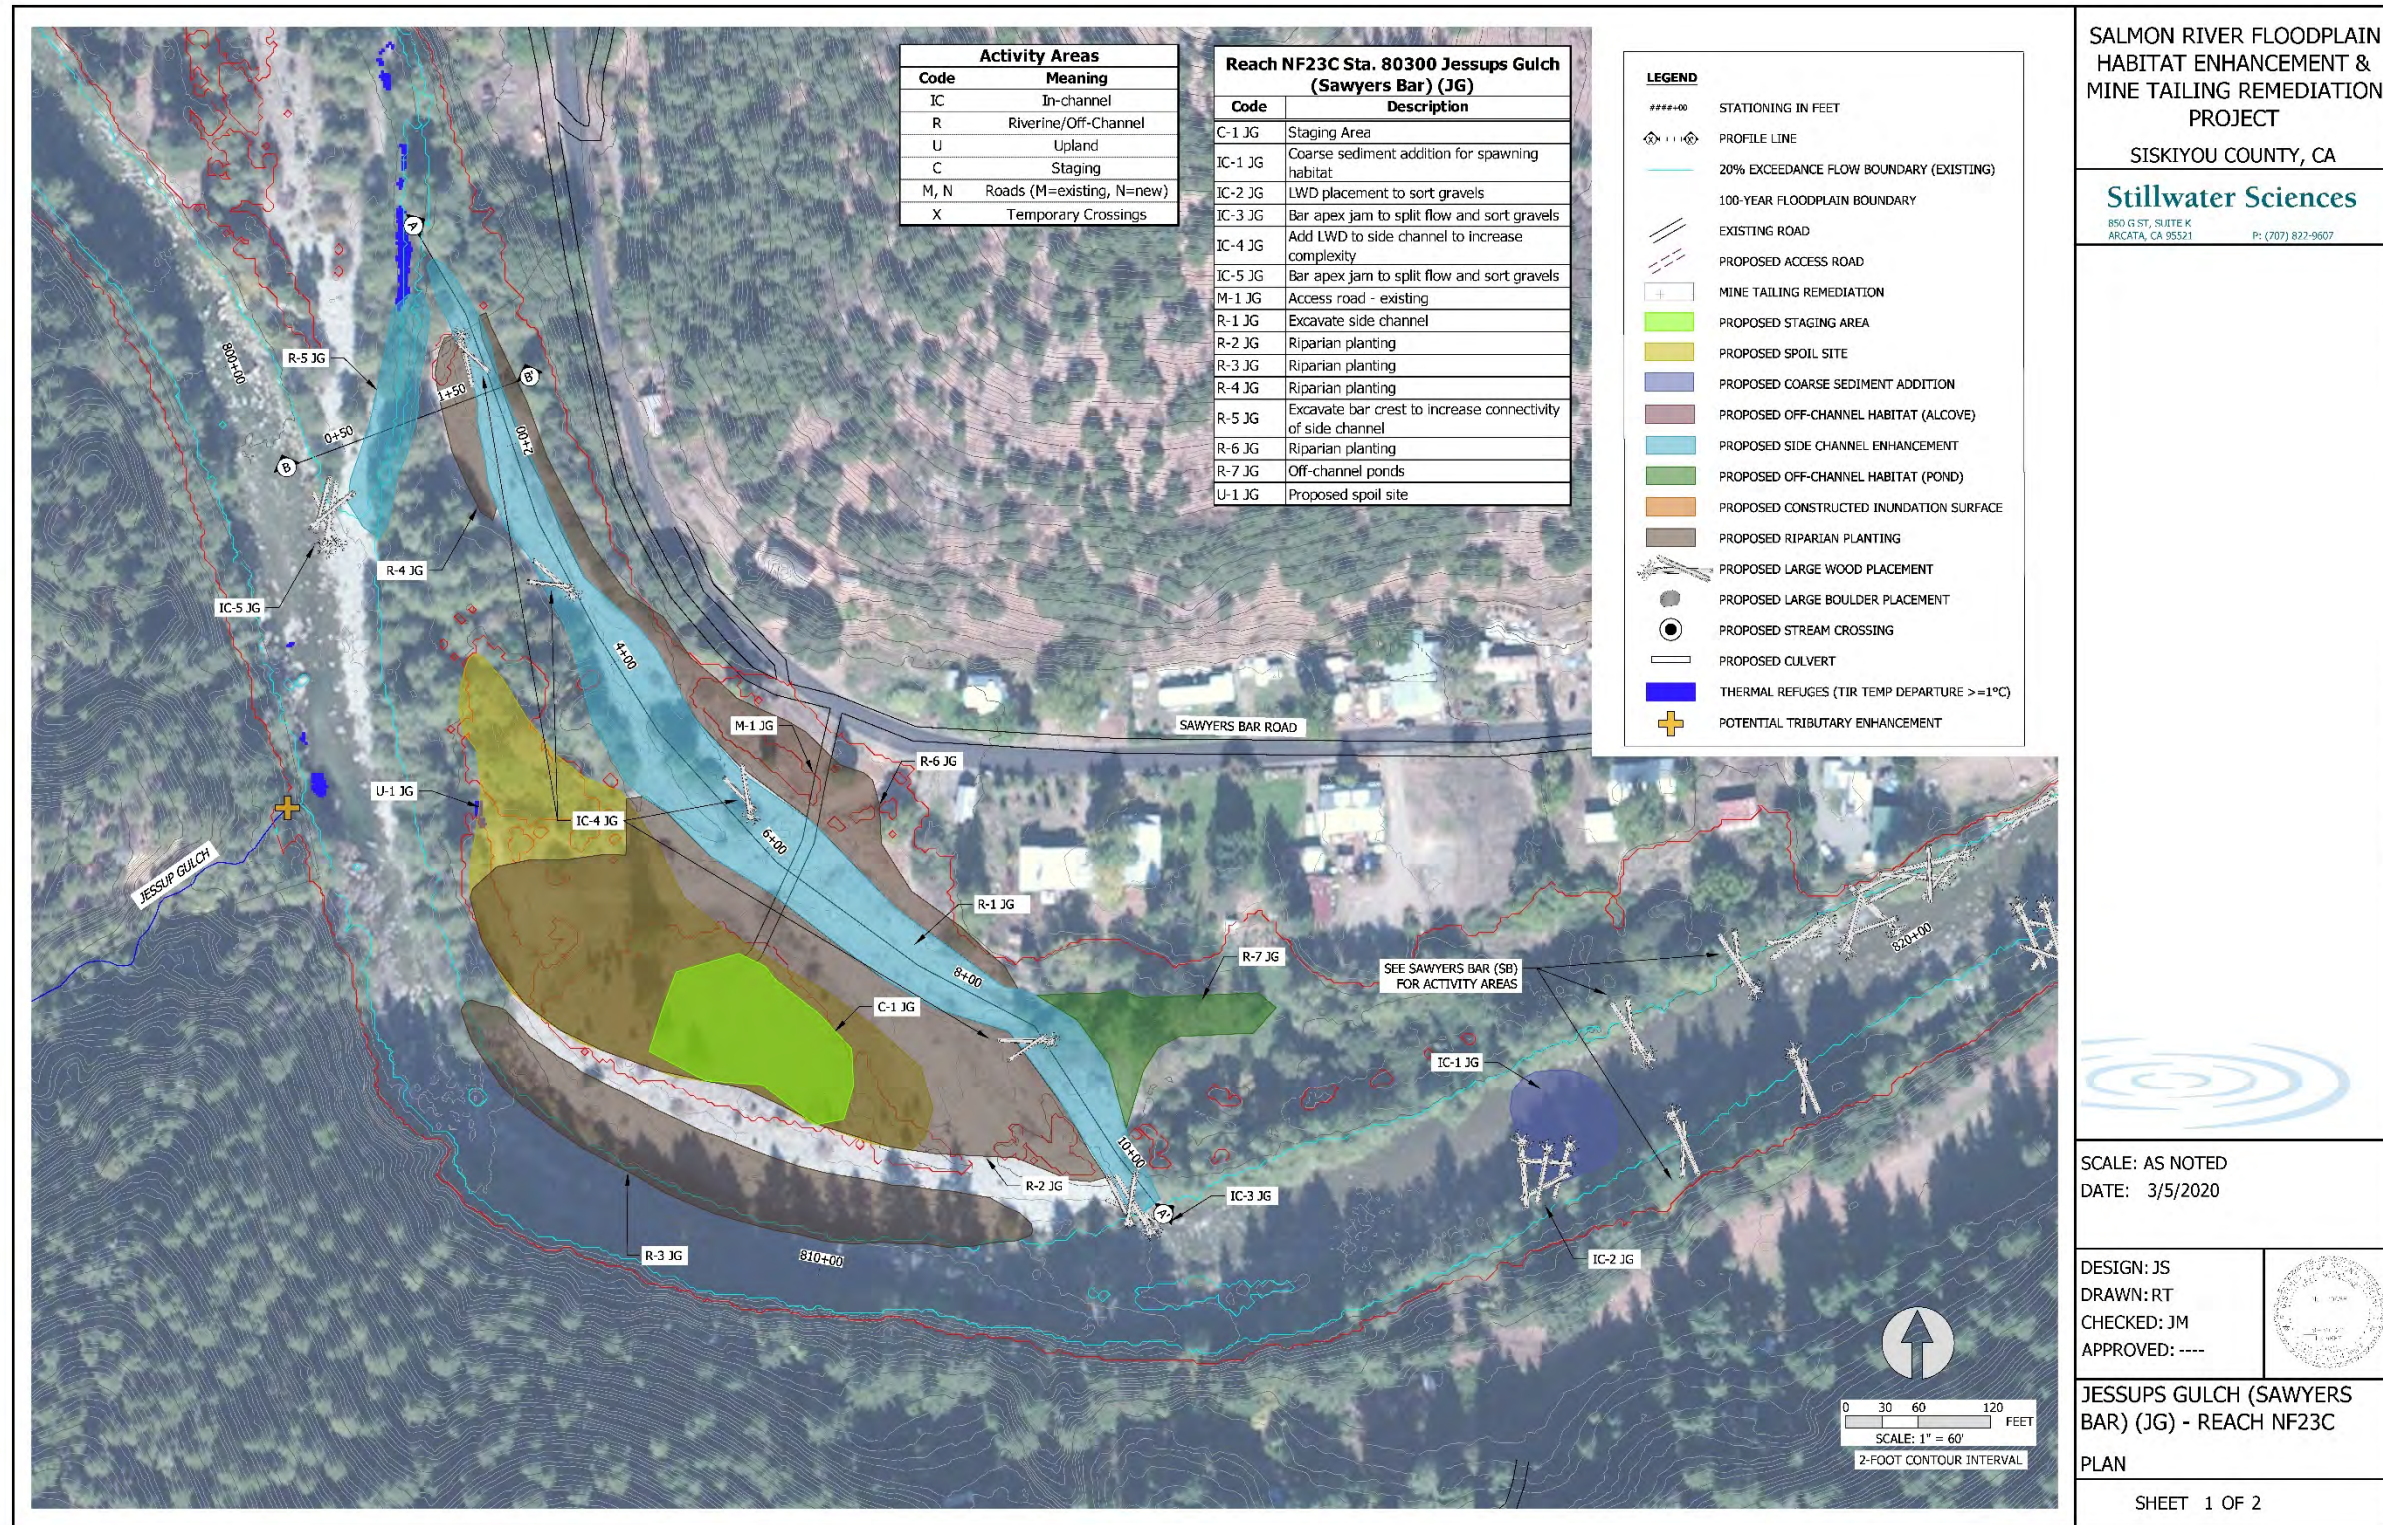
Design plan for North Fork Reach 23C at Jessups Gulch.
